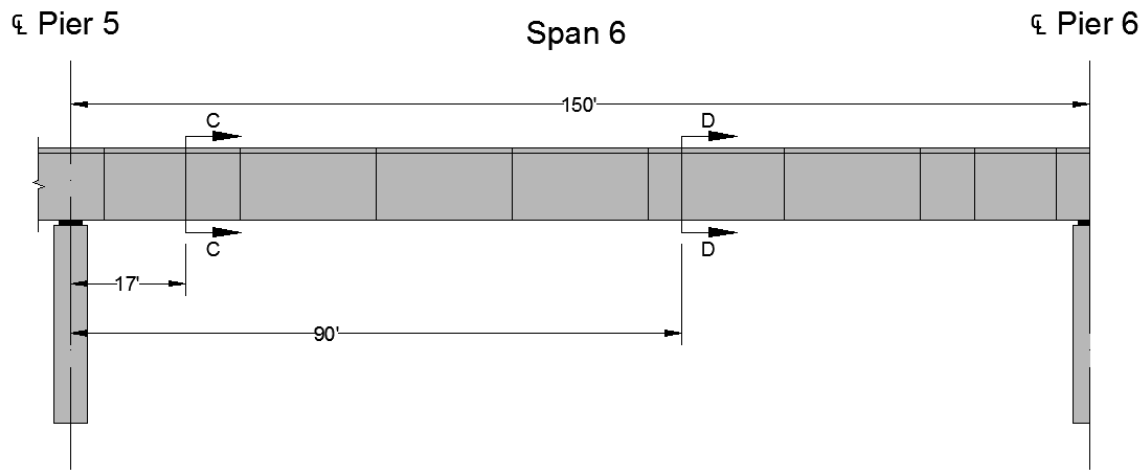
Varina-Enon Bridge Span 6 Elevation View Span 6 Instrument Locations
